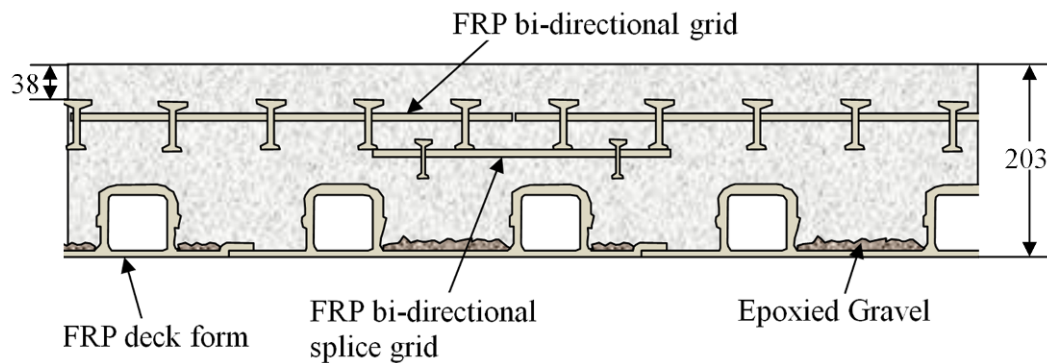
Hybrid system used in US-151/ Hwy 26 Bridge consisting of pultruded FRP structural form with aggregate bonded surface and tubular stiffeners as well as FRP grid for top layer of reinforcement (after [67])
